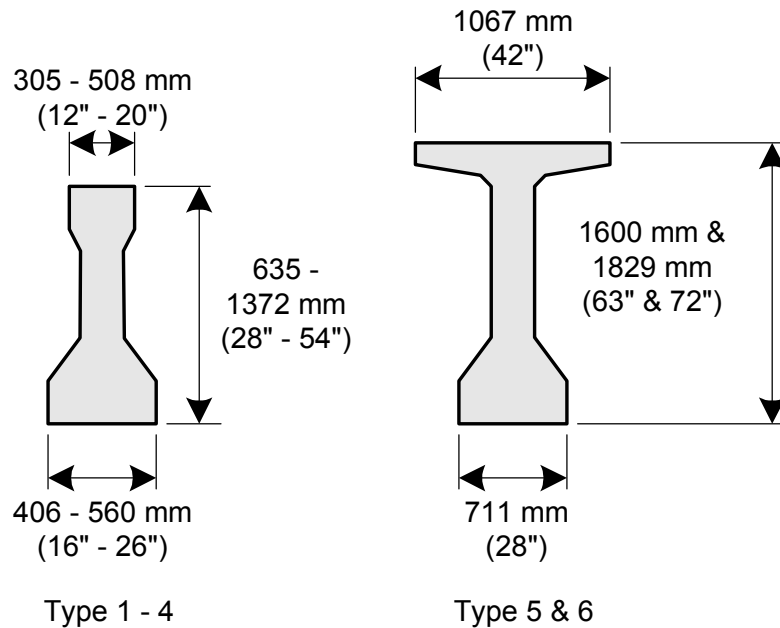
AASHTO Cross Sections of Prestressed I-Beams
